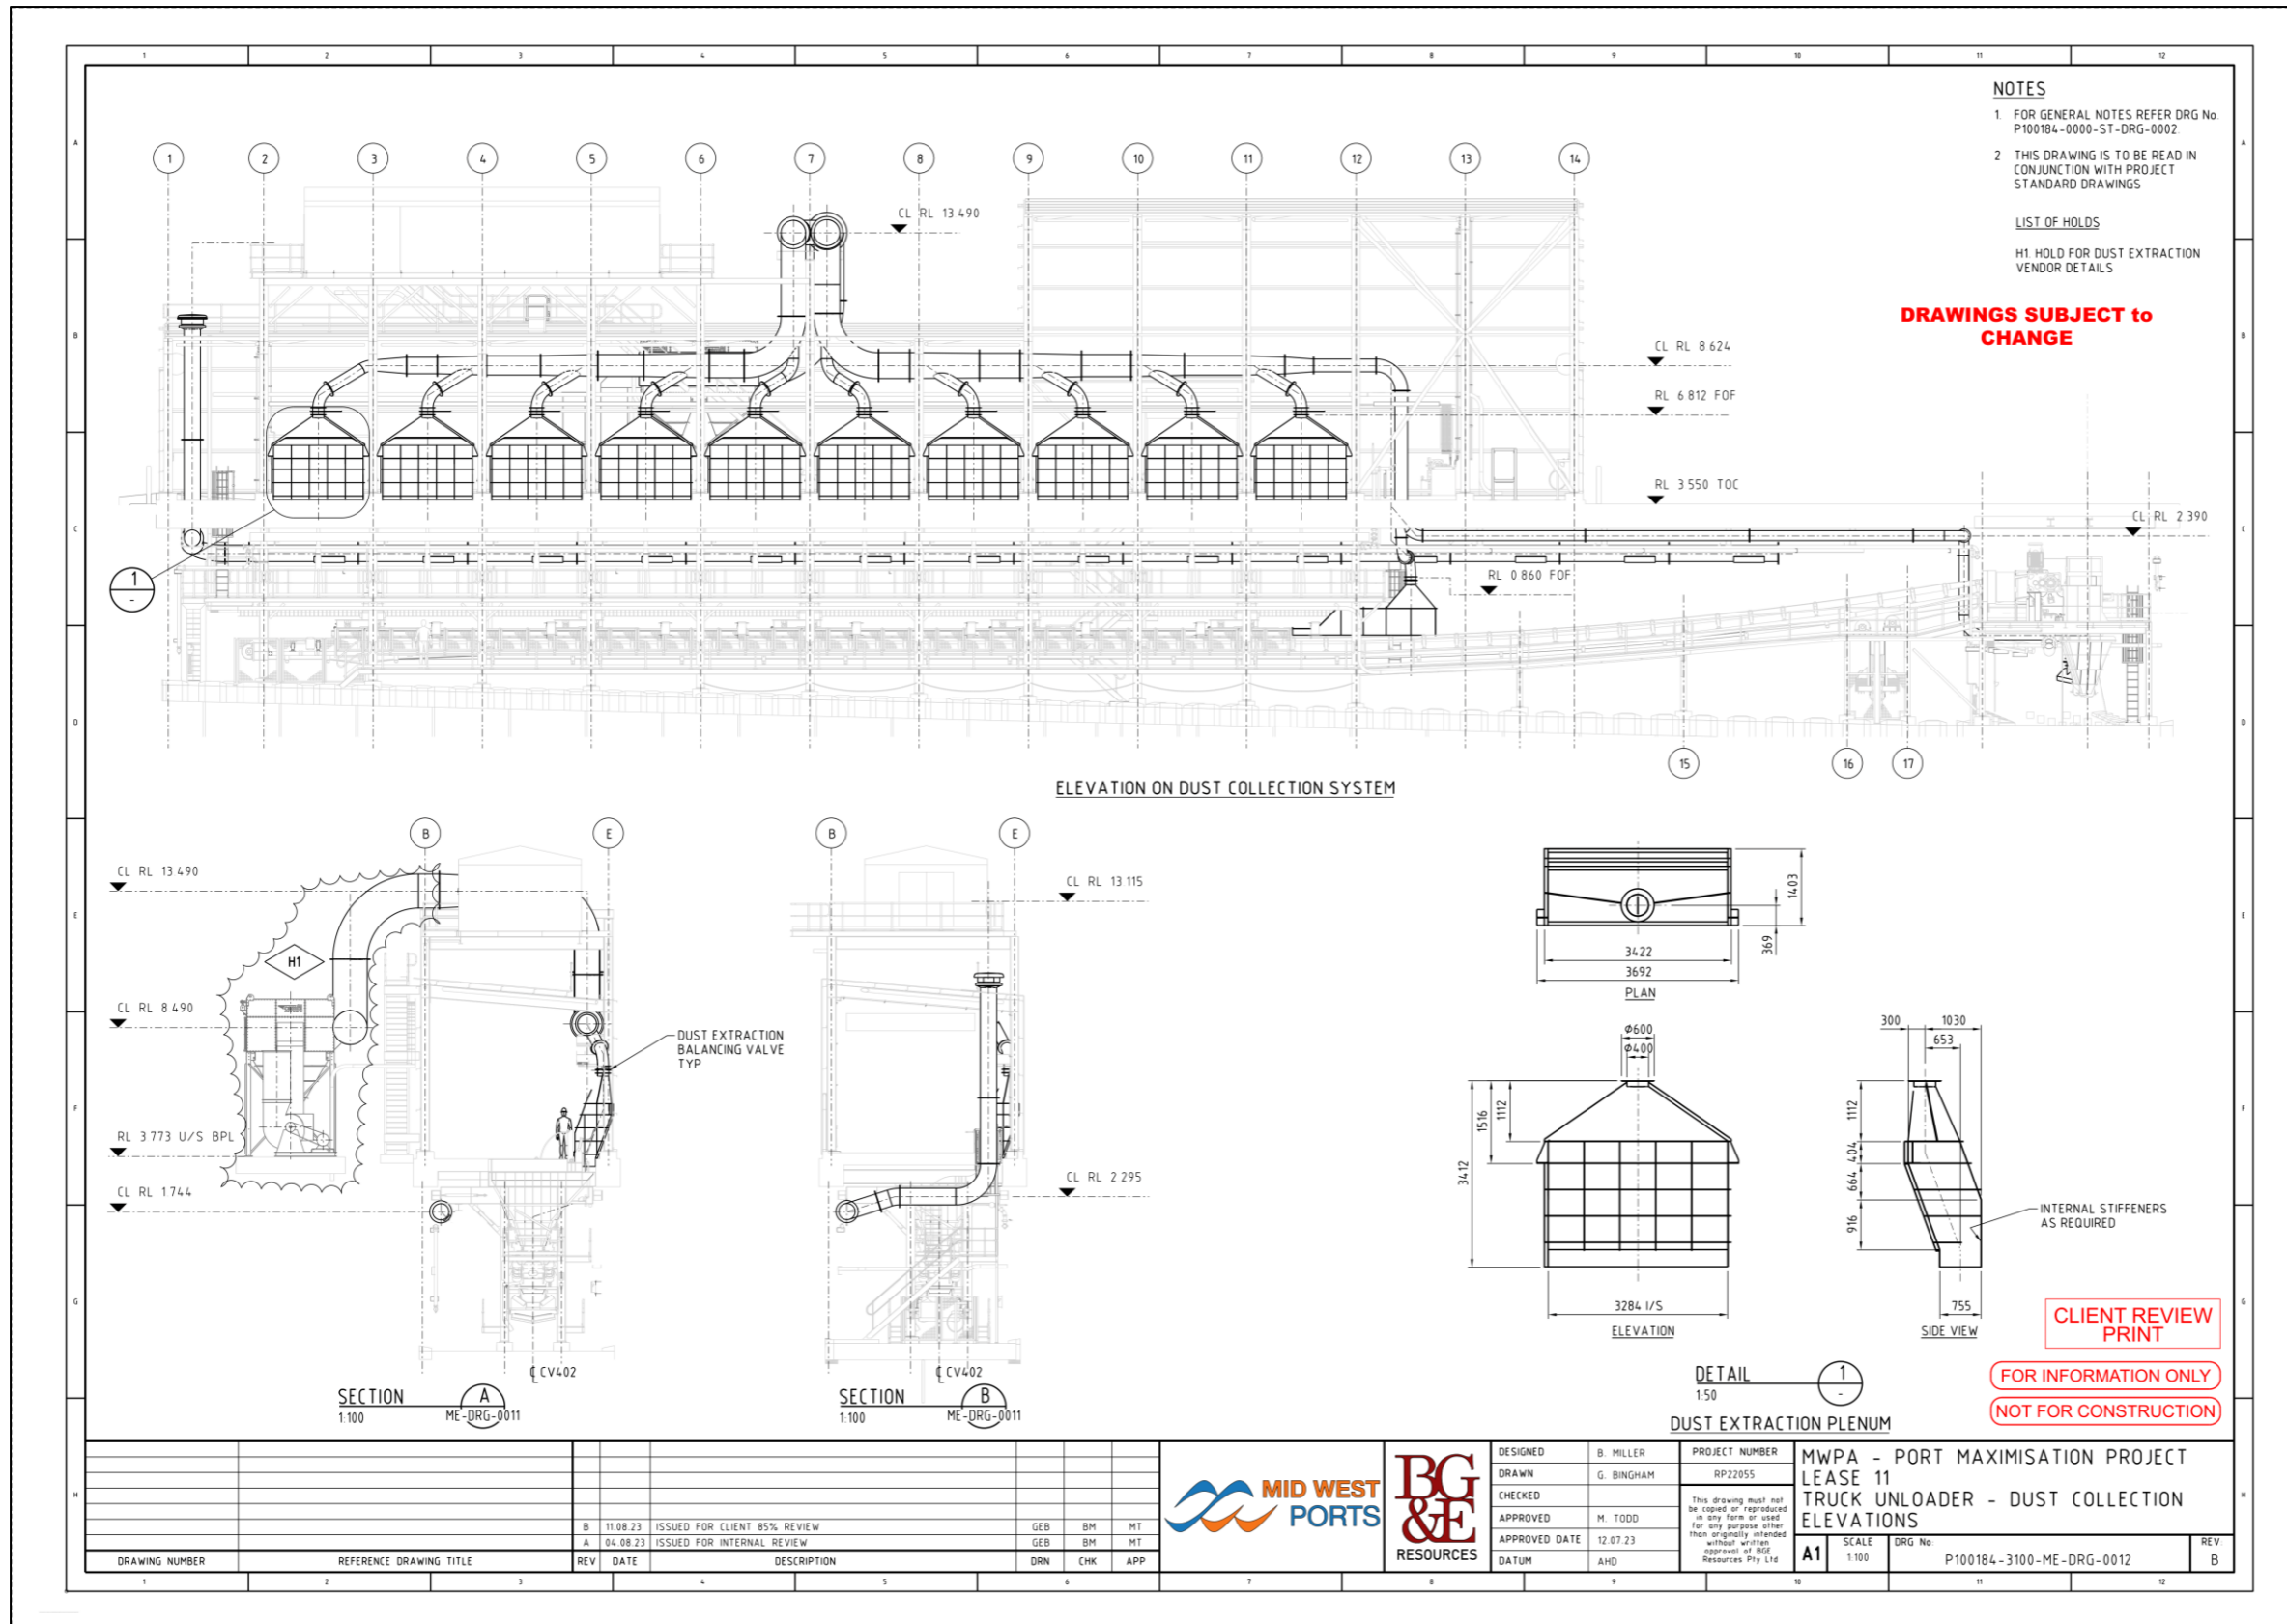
Construction drawing for baghouse dust extraction system – elevation and cross sections
